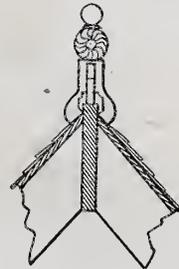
Detail of Cresting and Finial.—Scale, 1/2 Inch to the Foot.
